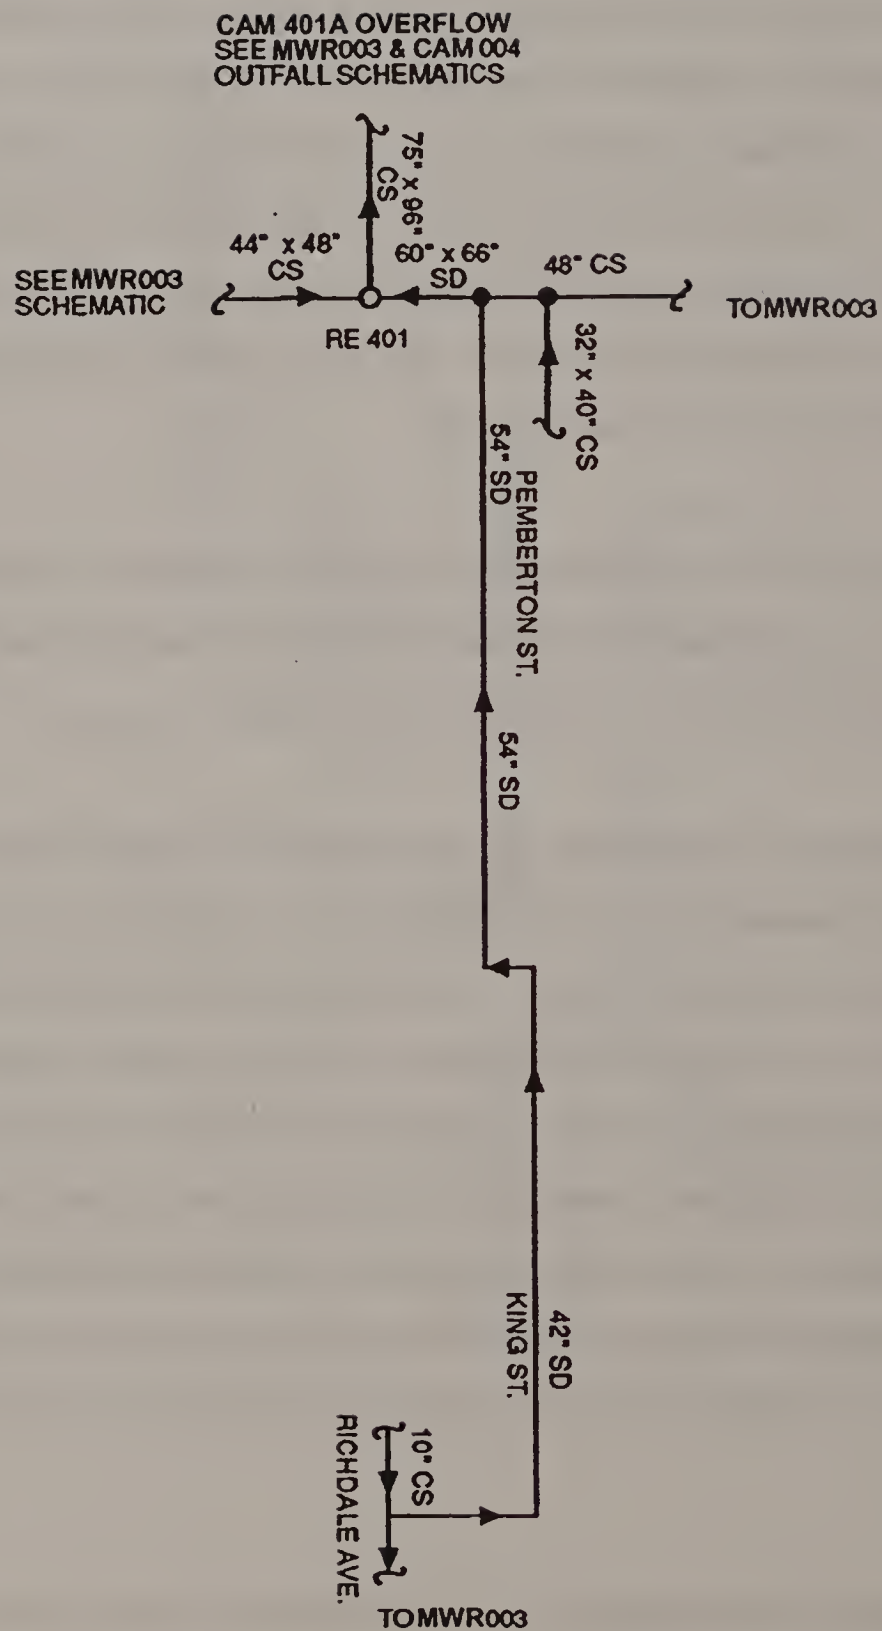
SCHEMATIC OF OUTFALL CAM401A
